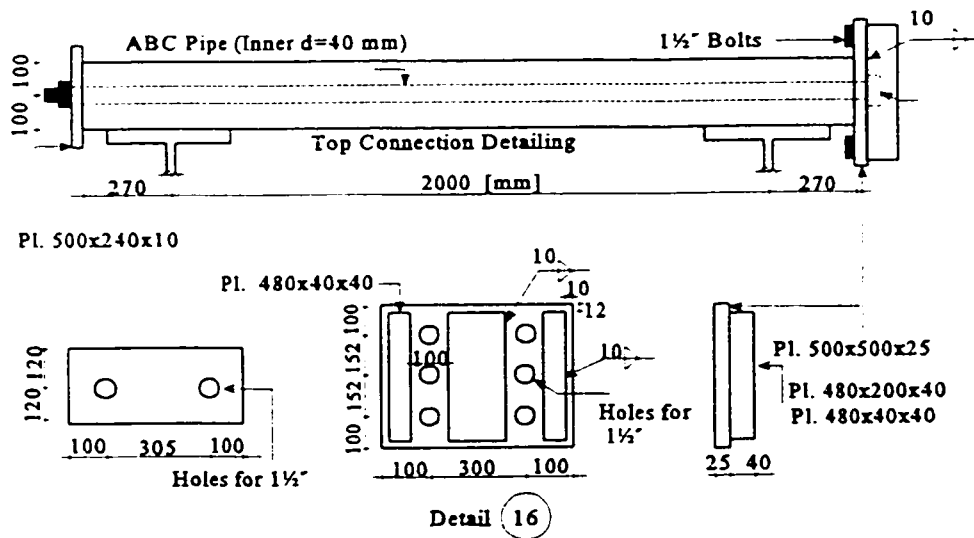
End plates to connect the specimen deck to the horizontal actuator.
